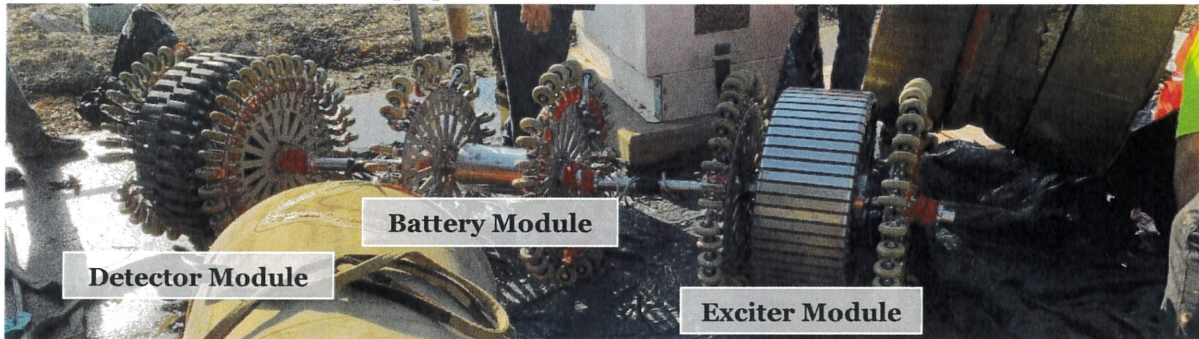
PICA’s Chimera RFT inspection tool prior to inspection of the Devil Canyon Raw Water Transmission Main. The tool is comprised of three modules connected by flexible linkages.
